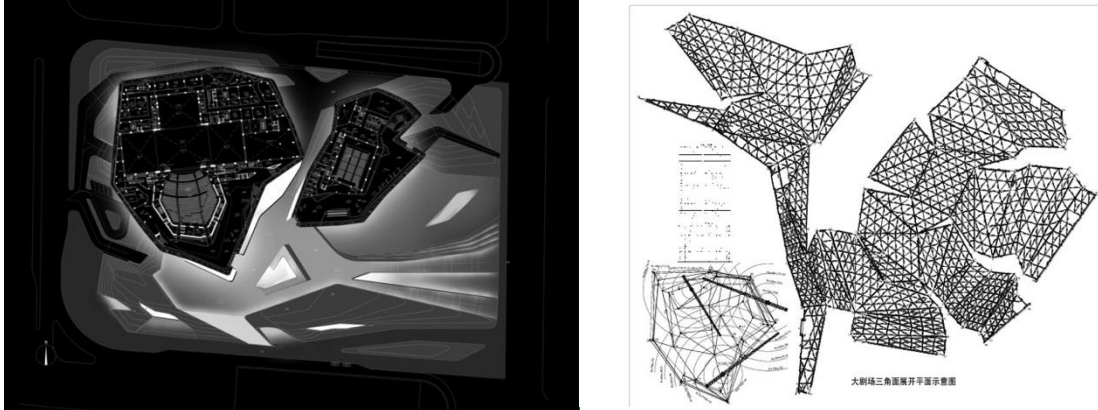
Ground Floor Plan Drawing and the schematic diagram of the extended triangular plane of the Great Theatre. Guangzhou Opera House, China. Zaha Hadid Architects (2004-2010).
